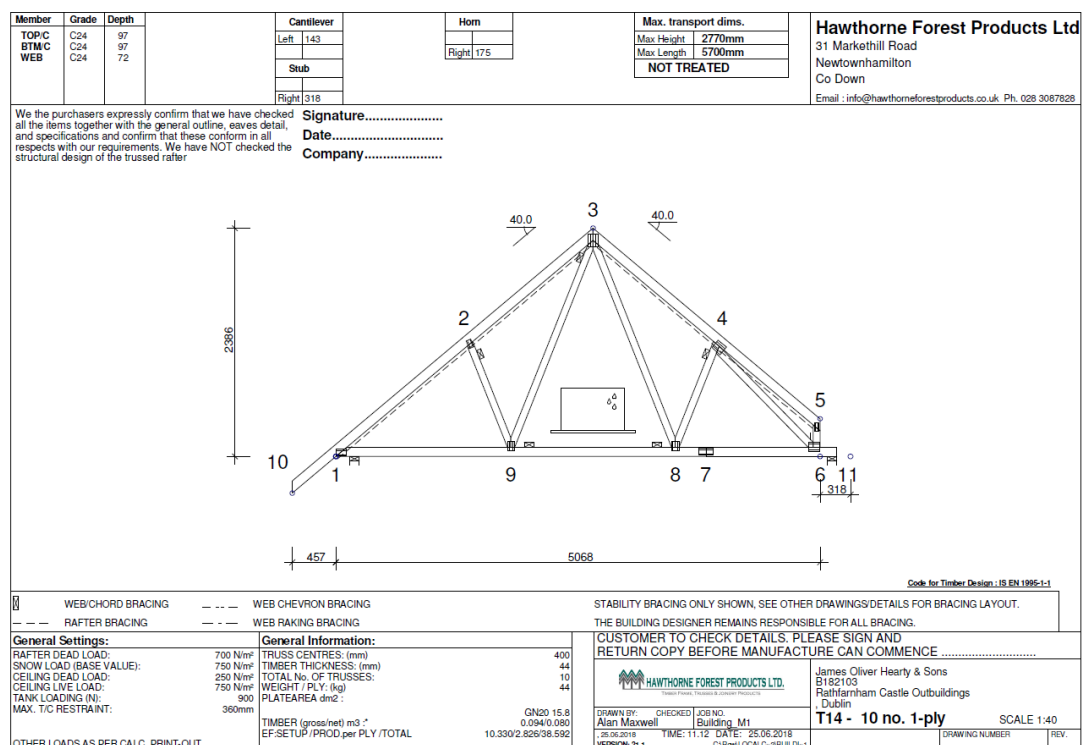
Extract Hawthorne Forest Products Ltd, drawing Building M1 truss type T14.
